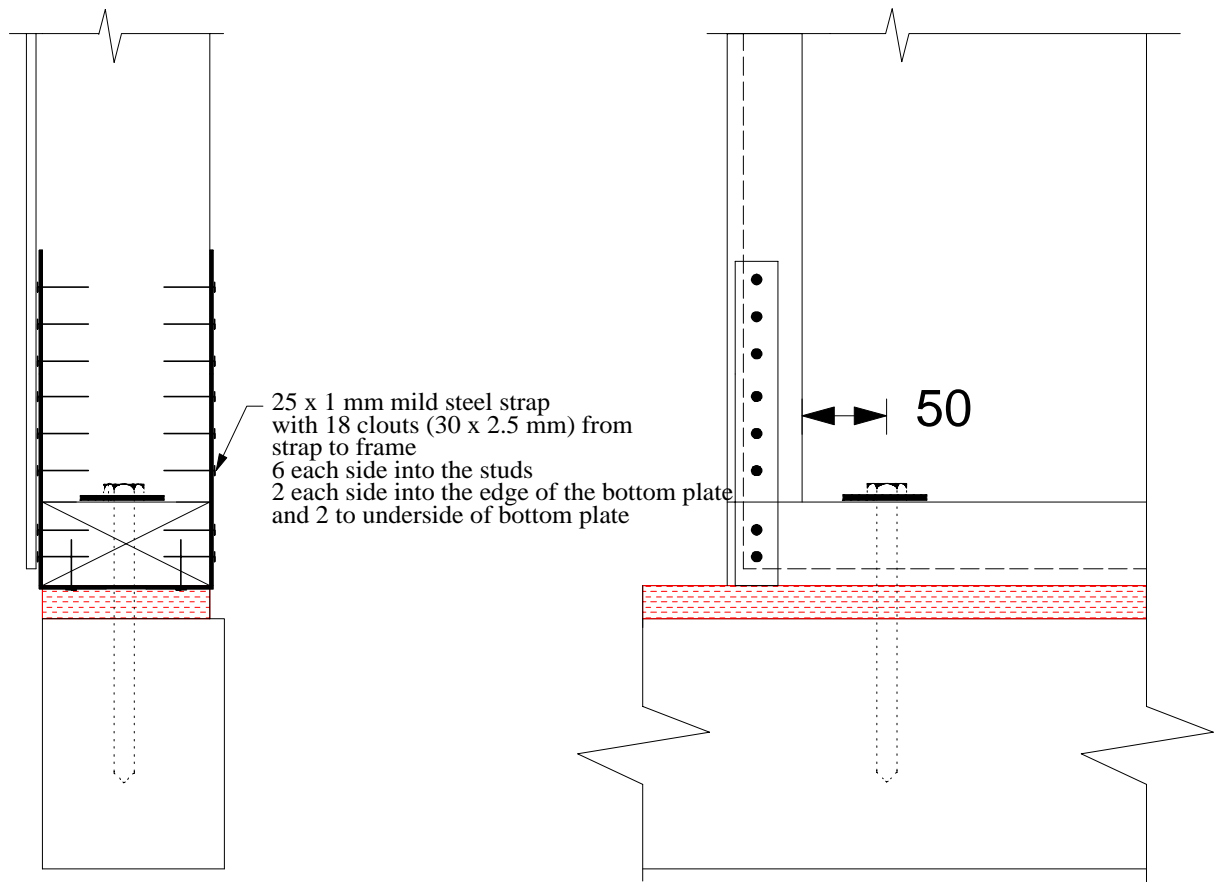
Fixing 0.6 m Long Walls to Simulated Concrete Foundations
